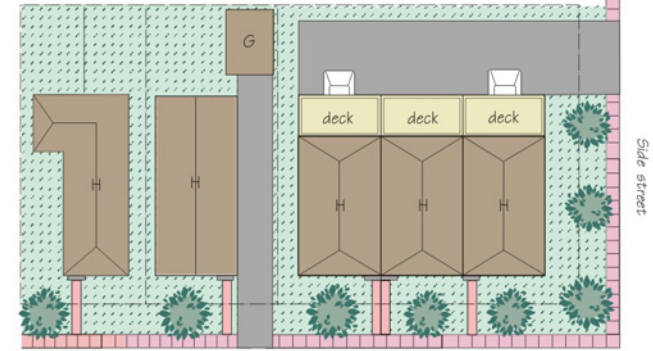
Note the absence of a sloped basement driveway, garage door, and retaining walls to support this infill development; instead here is room for a green front yard and ground-level windows.
